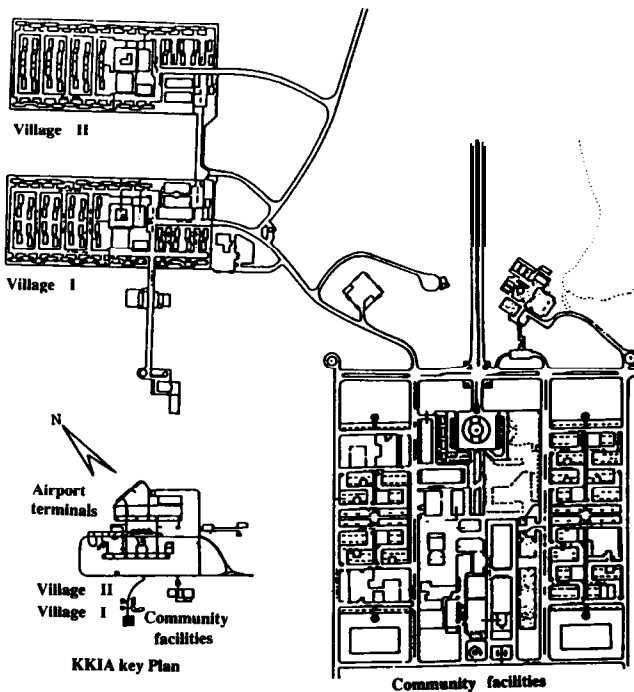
Key plan of KKIA and the layout plans of KKIA community facilities and villages I & II.
